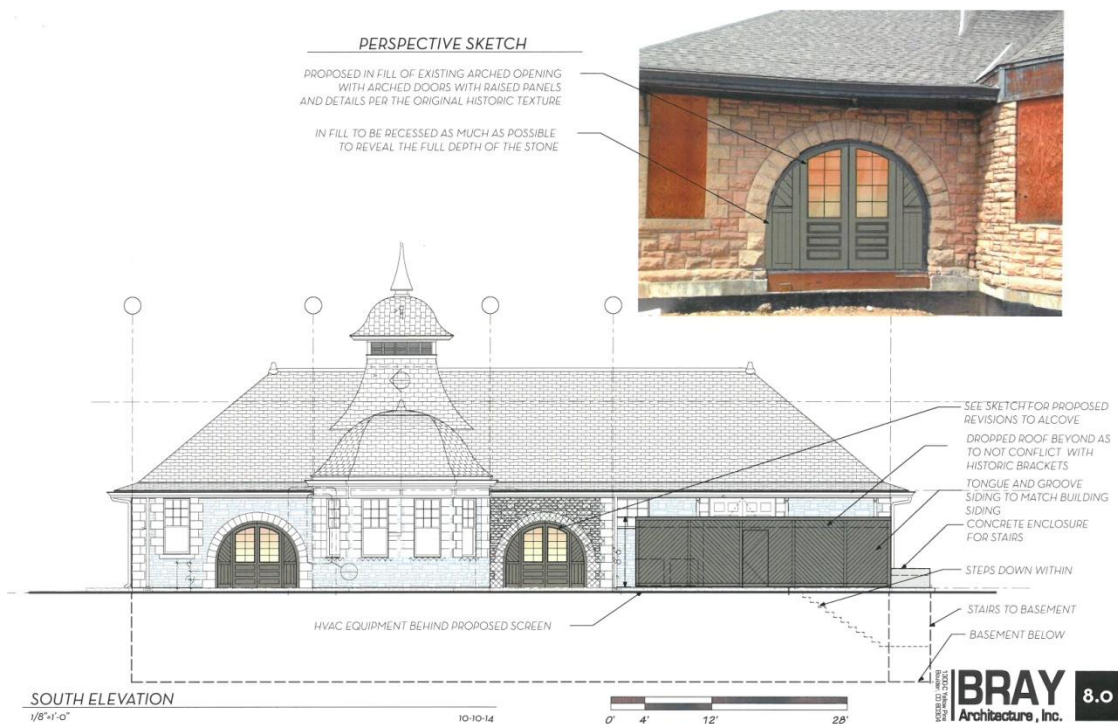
Current proposal South Elevation and Perspective Sketch, 2014.
